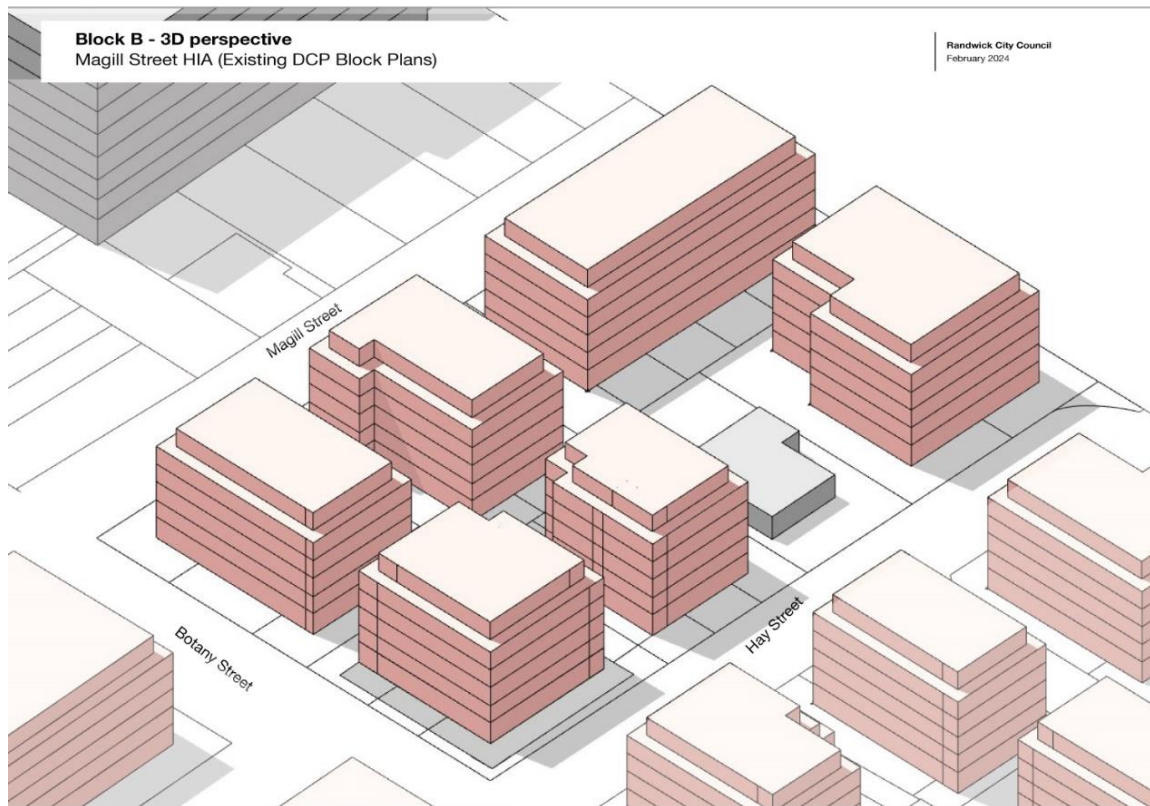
Magill Street HIA with 3:1 FSR. Height increased to 8 storeys and reduced building separation. Front setbacks of 6m retained. Site coverage retained between 44-47%.
